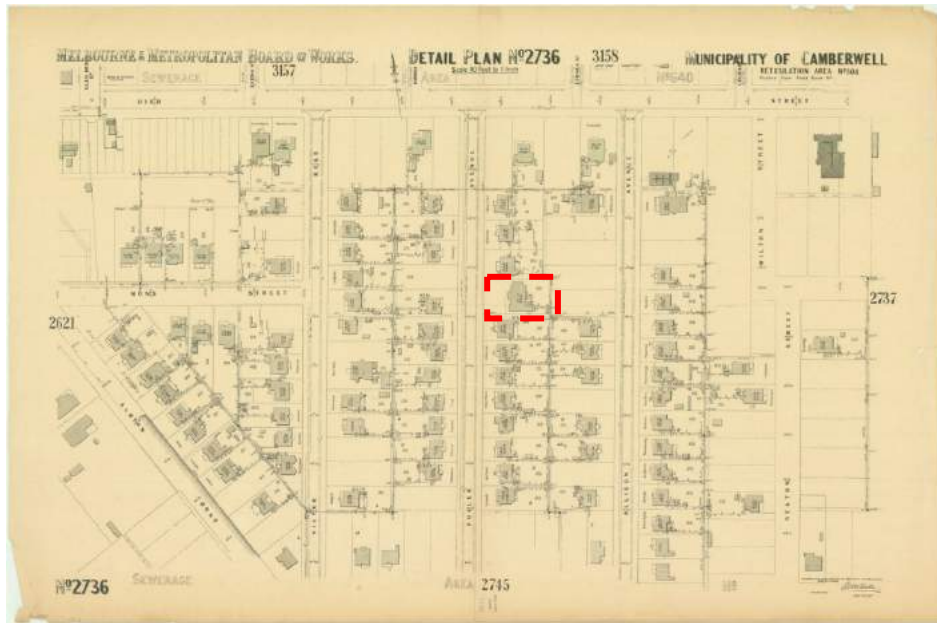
MMBW Detail Plan 2736, Municipality of Camberwell, 1927 (Source) SLV).
